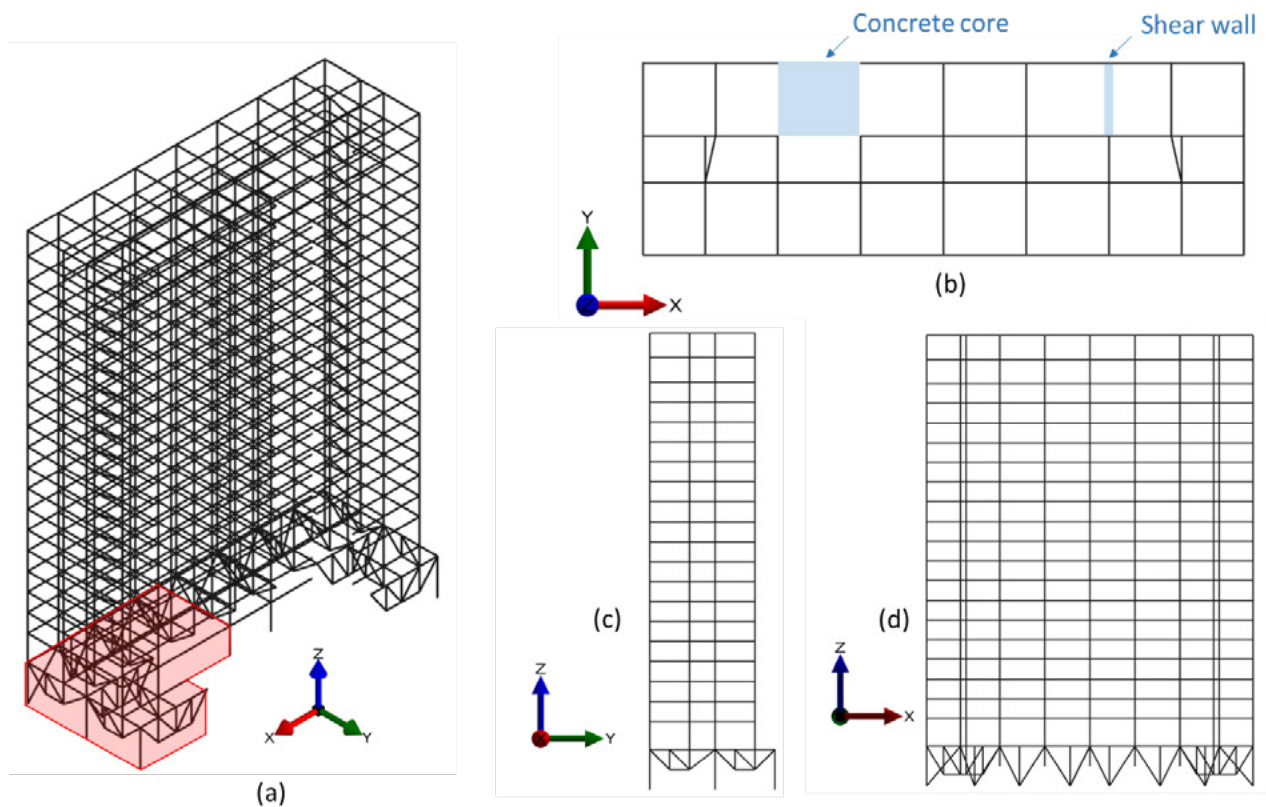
Building geometry in SAFIR: (a) isoparametric view, (b) plan XY view of the 20 residential floors with concrete core and shear wall locations, (c) side YZ view, and (d) side XZ view.
